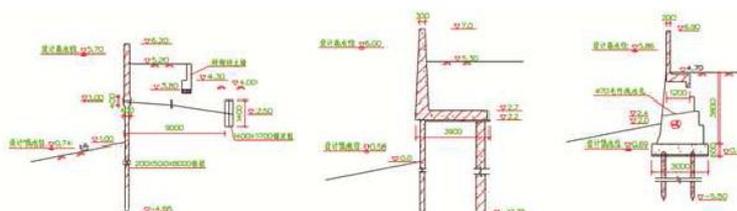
5. Typical Floodwall Cross Section in Shanghai (Source: (Ke et al., 2013))
